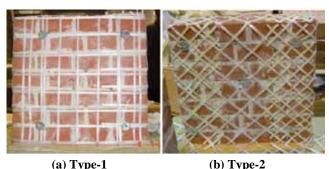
Masonry wall specimen retrofitted by PP-band mesh
